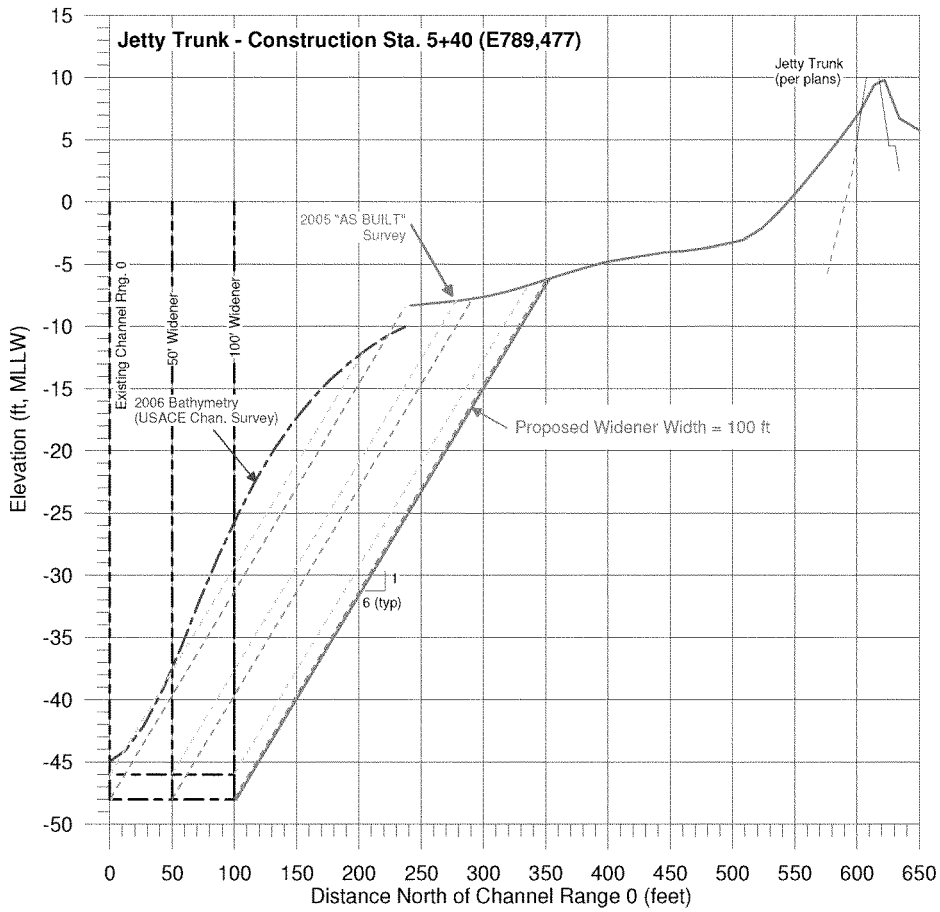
Proposed widener at USACE jetty Station 5+40 relative to the north jetty – jetty position is based upon the 2005 as-built survey and construction drawings.
